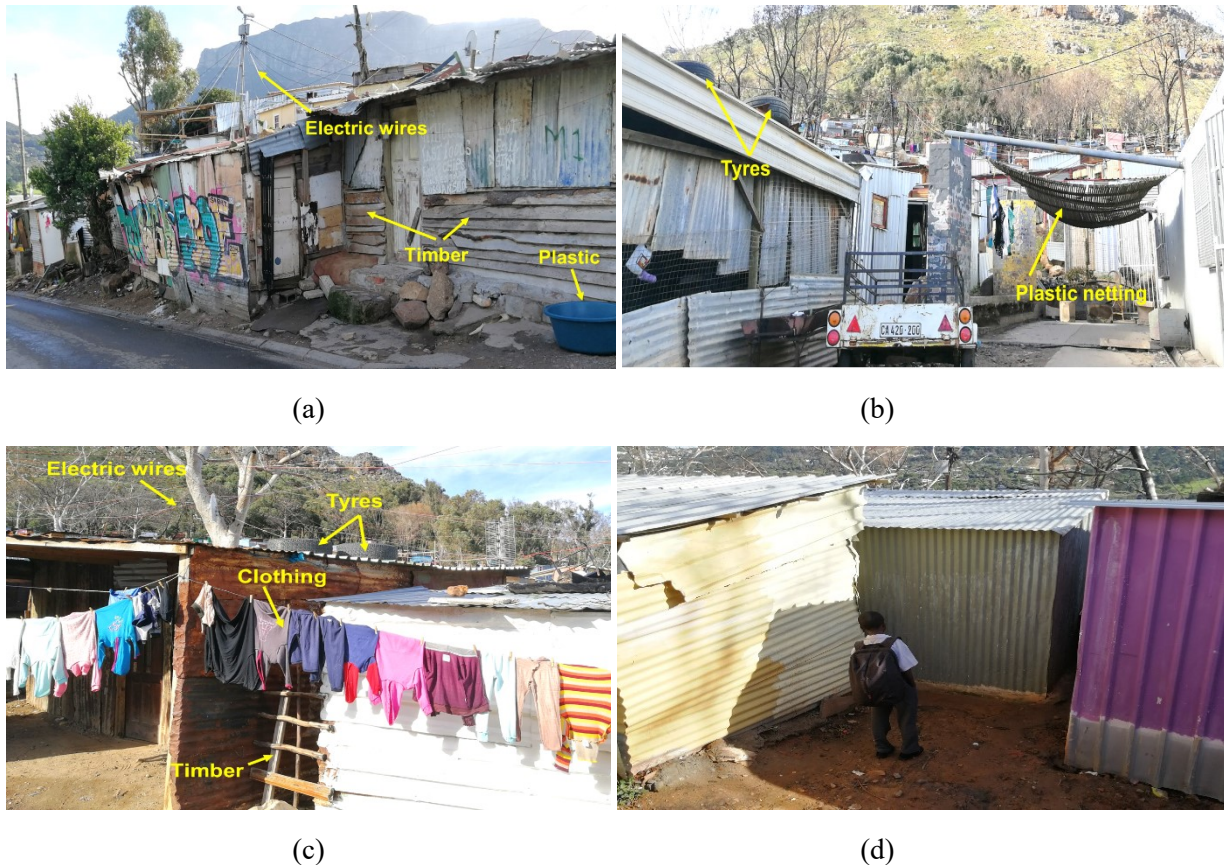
Pictures taken in the survey in Imizamo Yethu informal settlement, South Africa showing the many materials that comprise the structural systems and that are used between and on the dwellings, specifically: a) roadside dwellings with a mix of timber and metal wall systems; b) homes with tyres on the roofs and shade netting in between homes; c) timber and clothing spanning between dwellings; and d) the close proximity of dwellings in Imizamo Yethu
